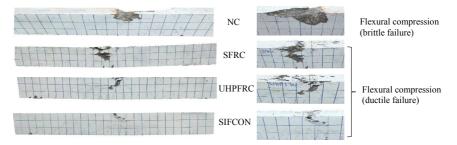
Crack pattern and failure modes of over-reinforced concrete beams
